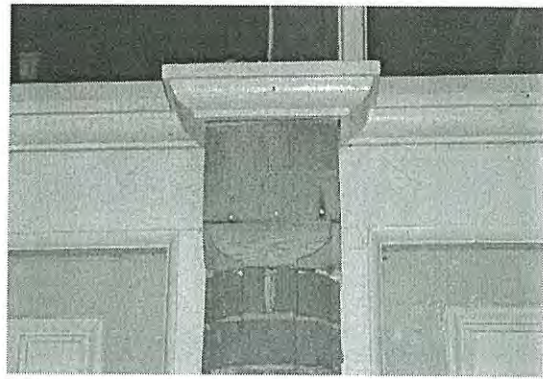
Interior, Exchange Hall (space H01). Detail of introduced plywood capital to pier on north wall.
